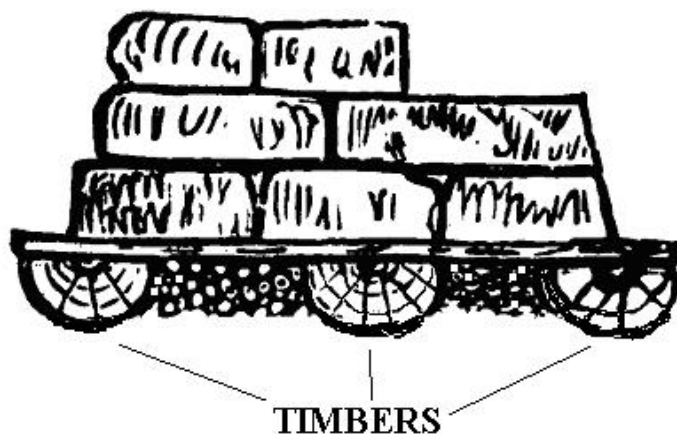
Timber raft foundation in masonry bridges (Hasley 1883)
